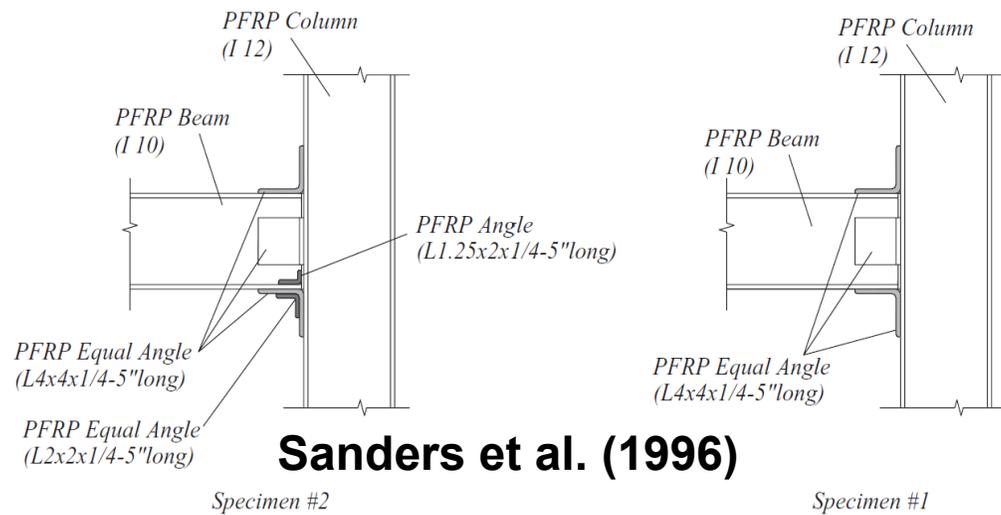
Exterior PFRP beam-to-column bonded connection setup.
